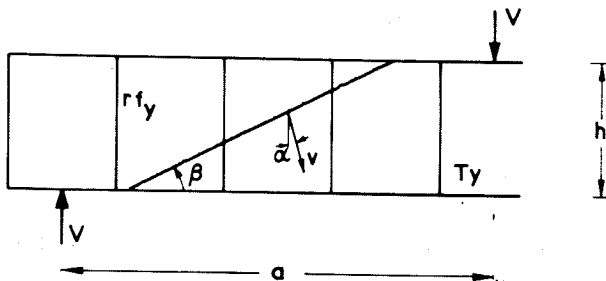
Failure mechanism of beam with vertical stirrups subjected to point loading
